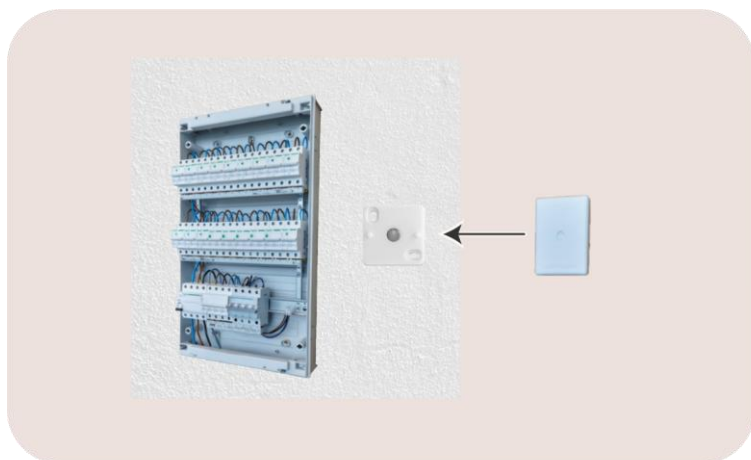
View on a distribution panel and gateway connected to a wall mounting plate
